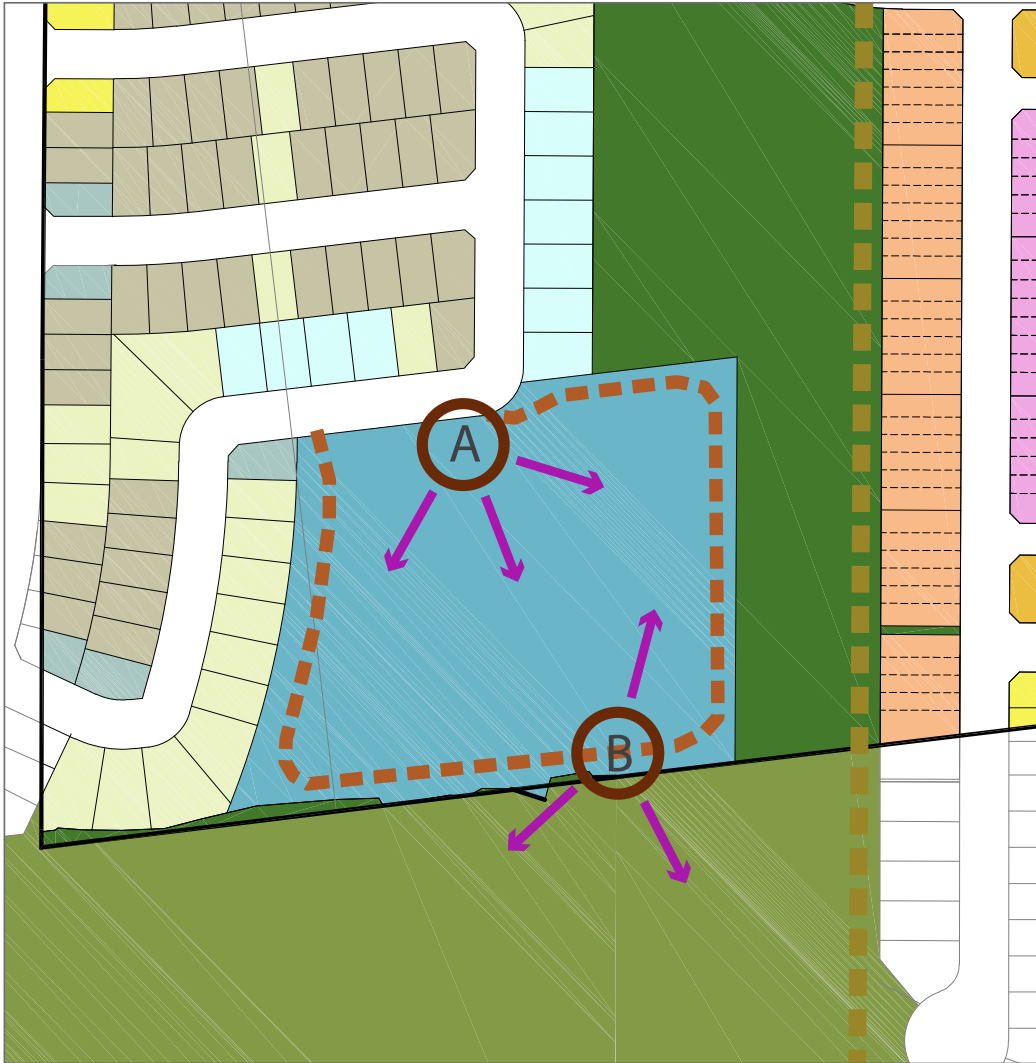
Conceptual SWM pond layout showing intended location of trail / service access road and potential siting of lookout amenity features.
